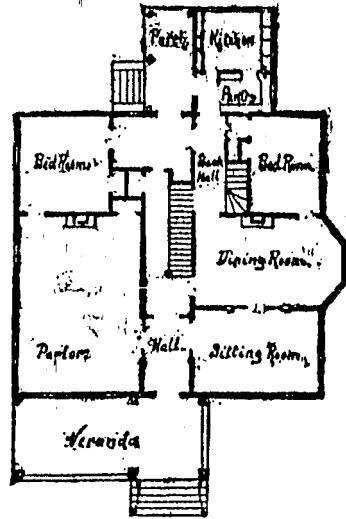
GROUND PLAN OF IMPROVED HOUSE.
